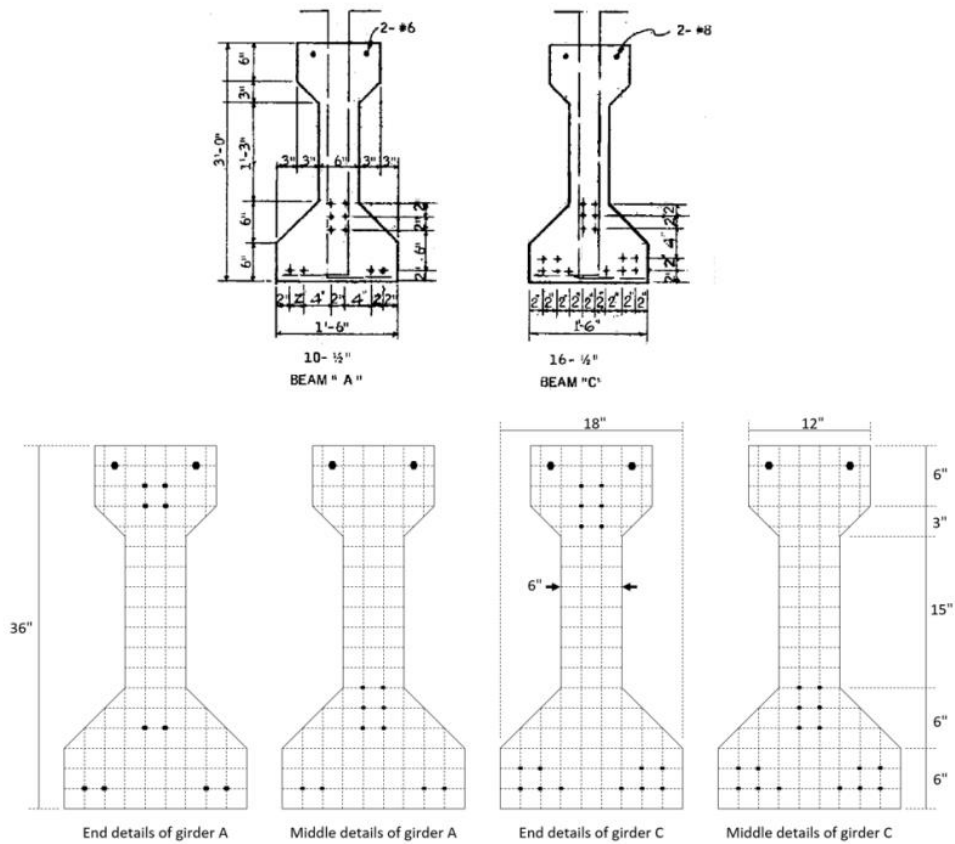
Two typical girder cross-sections, “A”, and “C” [34]
